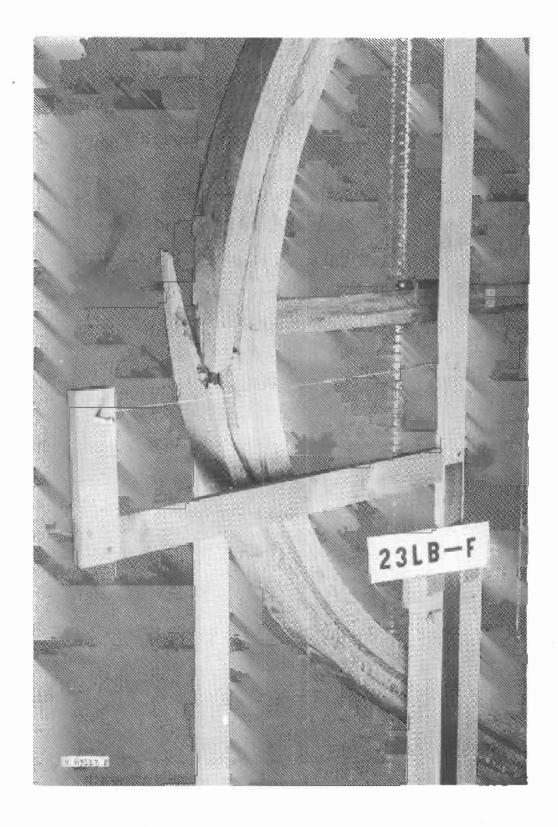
Laminated frame in testing machine showing typical failure under end-thrust loading.
